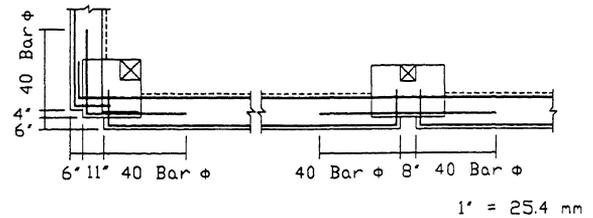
Eccentricity of spandrel beam and column connection in plan.
